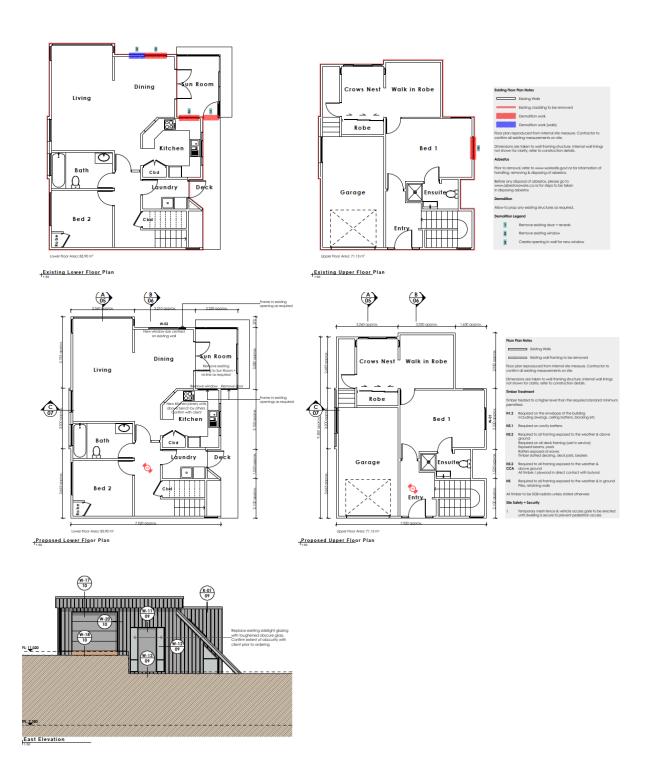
Proposal – floor plans (existing and proposed) and street elevation
